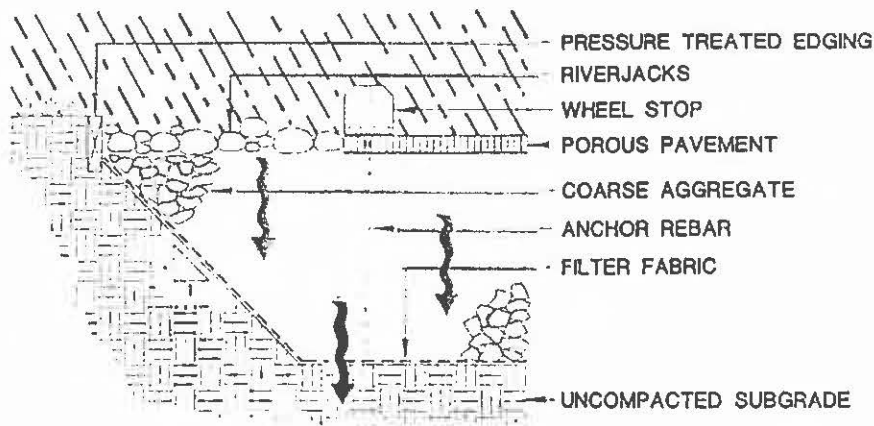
Unpaved section (river jacks) provides backup infiltration.
